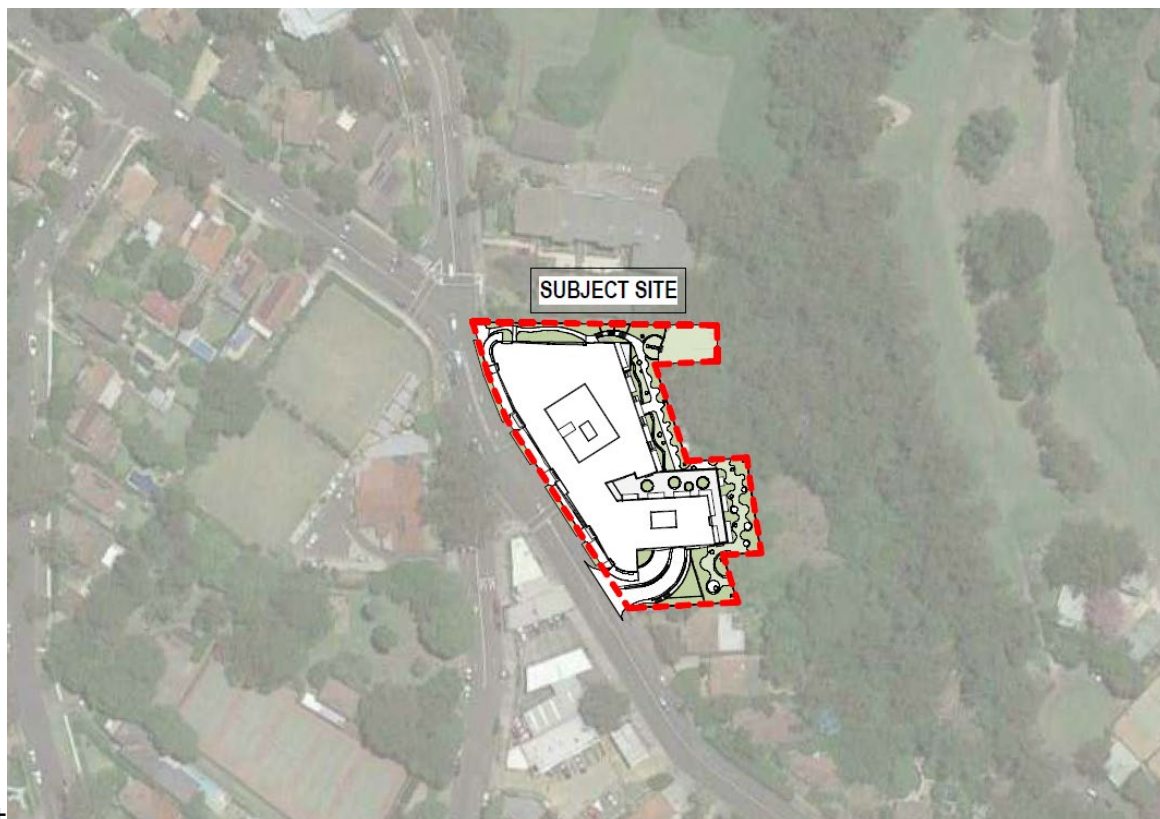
Proposed site plan (Source: Morrison Design Partnership Architects)
